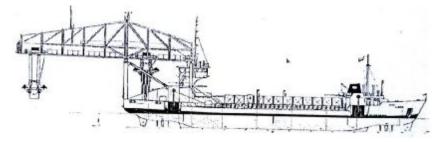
Concrete blocks dumping vessel for Hook of Holland breakwater
